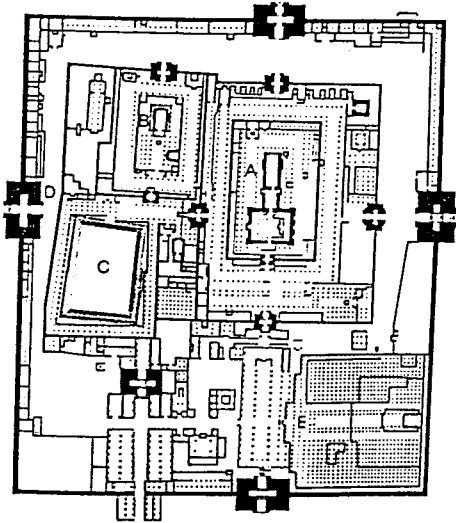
Layout plan of the Minaksi-Sundaeswara Temple, Madurai.
